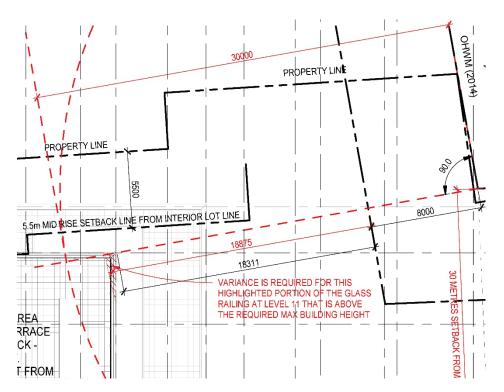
This image shows portion of the architectural glass railing on level 11 that is within 30 metres of OHWM and over the required 31.37 metres of building height limit
